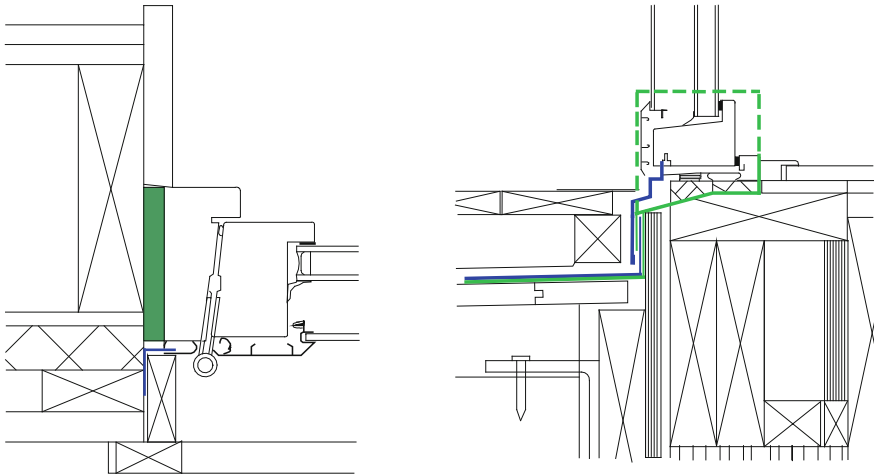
Left: Improved connection with steel profile behind reveal (blue line). Right: Improved connection with a sealing layer (green line), on top of the sill and on the side of the wall opening (dotted green line)
